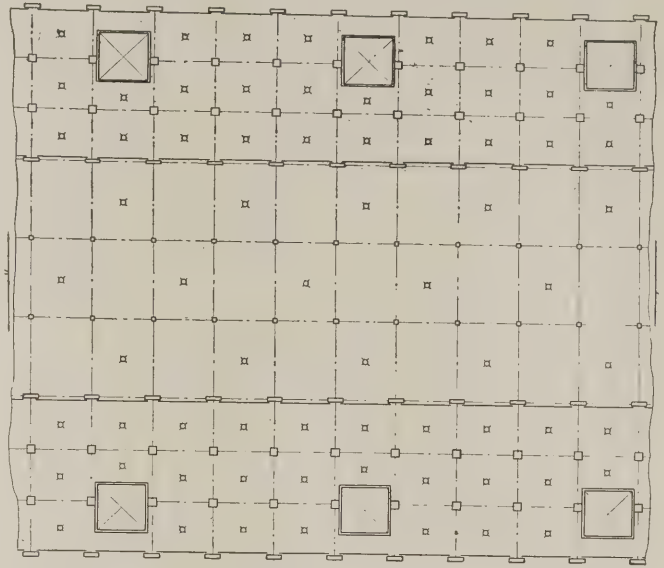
Plan of Sorting Areas and Driveway Showing Location of Lighting Units
